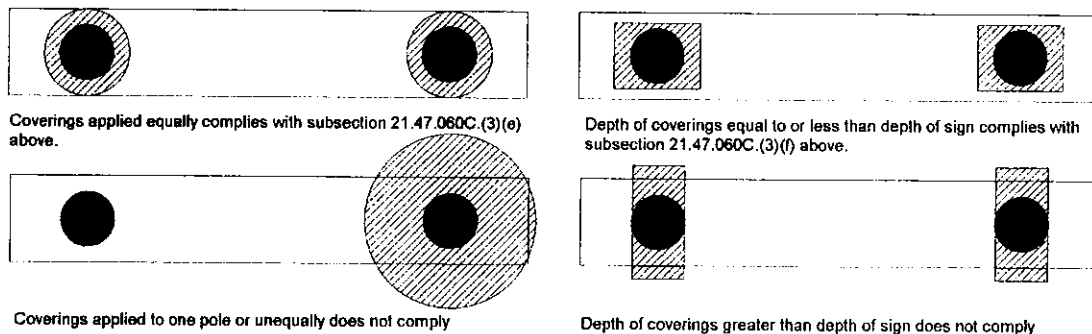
Examples of pole wrap. Poles depicted in plan view.
